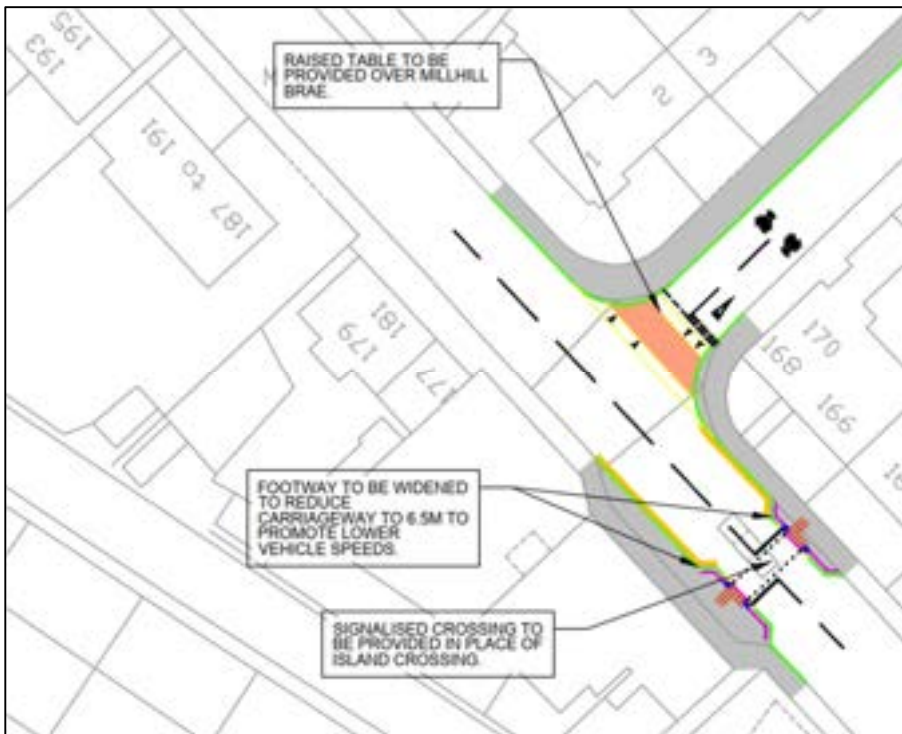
Proposed widening of footway to provide a new signalised crossing
